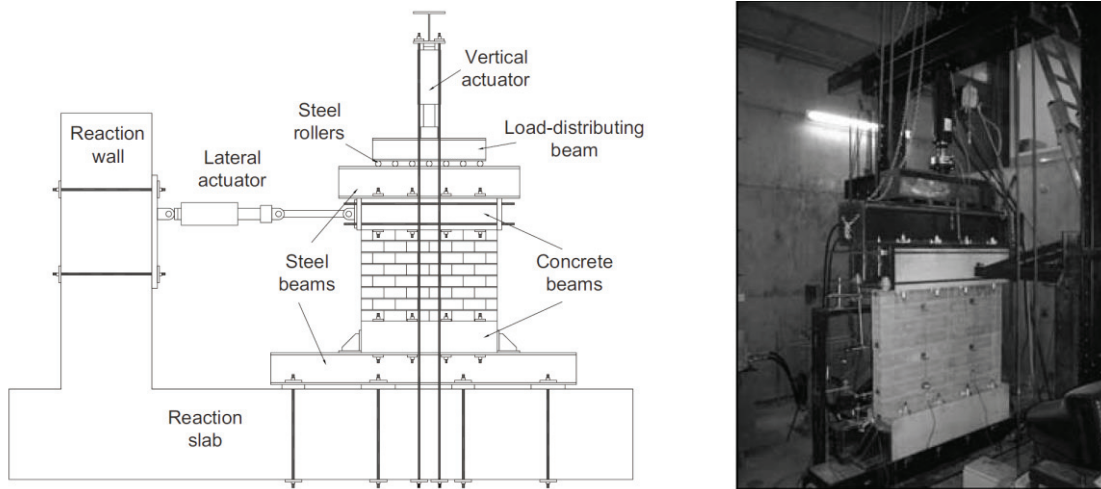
Test setup for in-plane cyclic horizontal load (Haach et al., 2010)
